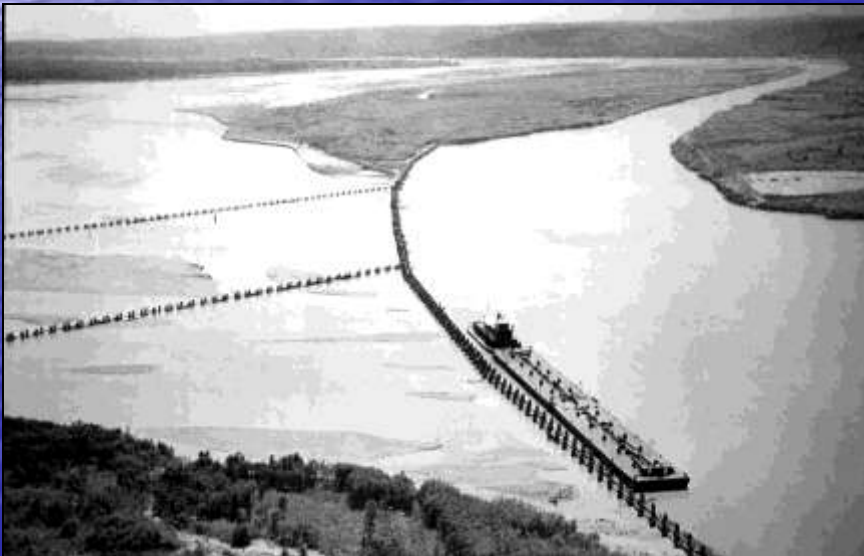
Hydraulic-fill levee construction with pipe-line dredge
